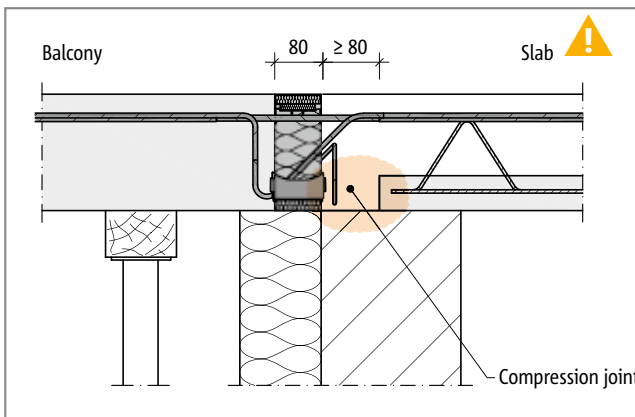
Schöck Isokorb® T type K-E, K-T: Installation in conjunction with pre-fabricated slab with wall support, compression joint on the floor side
